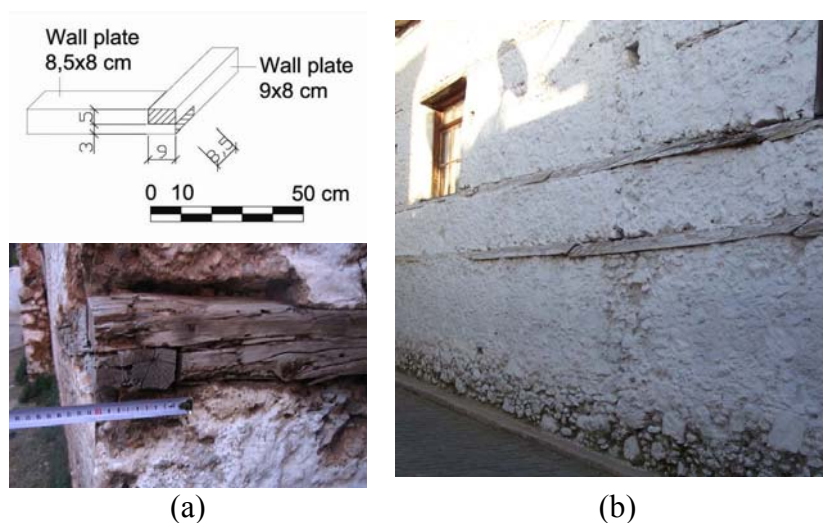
a. wall plates with half-lap joints at the corner (Şahidi St. No: 26), b. wall plates running through the whole façade with scarf joints (Yayla St. No: 18)
